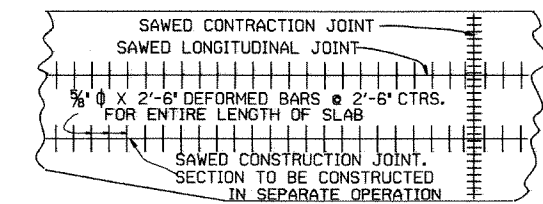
DETAIL OF SAWED LONGITUDINAL JOINT AND LONGITUDINAL CONSTRUCTION JOINT
